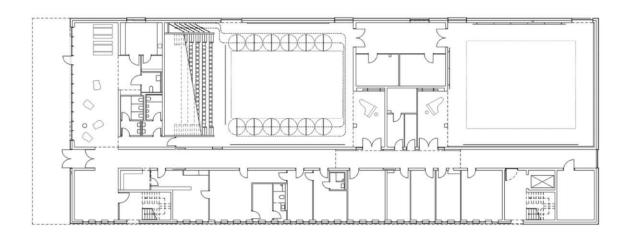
, 01 Floor Plan - ballet rooms are located at the top of the plan. gmp Architekten
